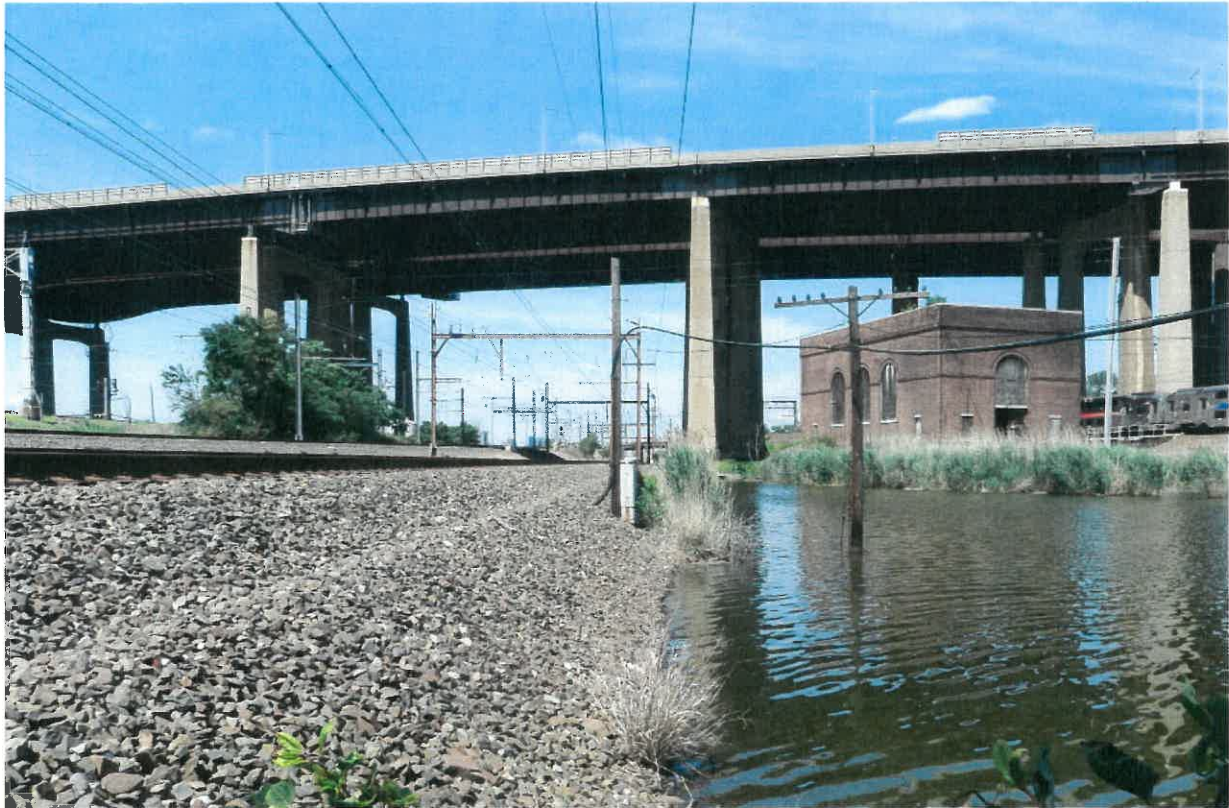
Photo G: View facing west of M&E Asset #16. Vegetation adjacent to the asset is upland and are is flagged as open water (Line OW-F).
